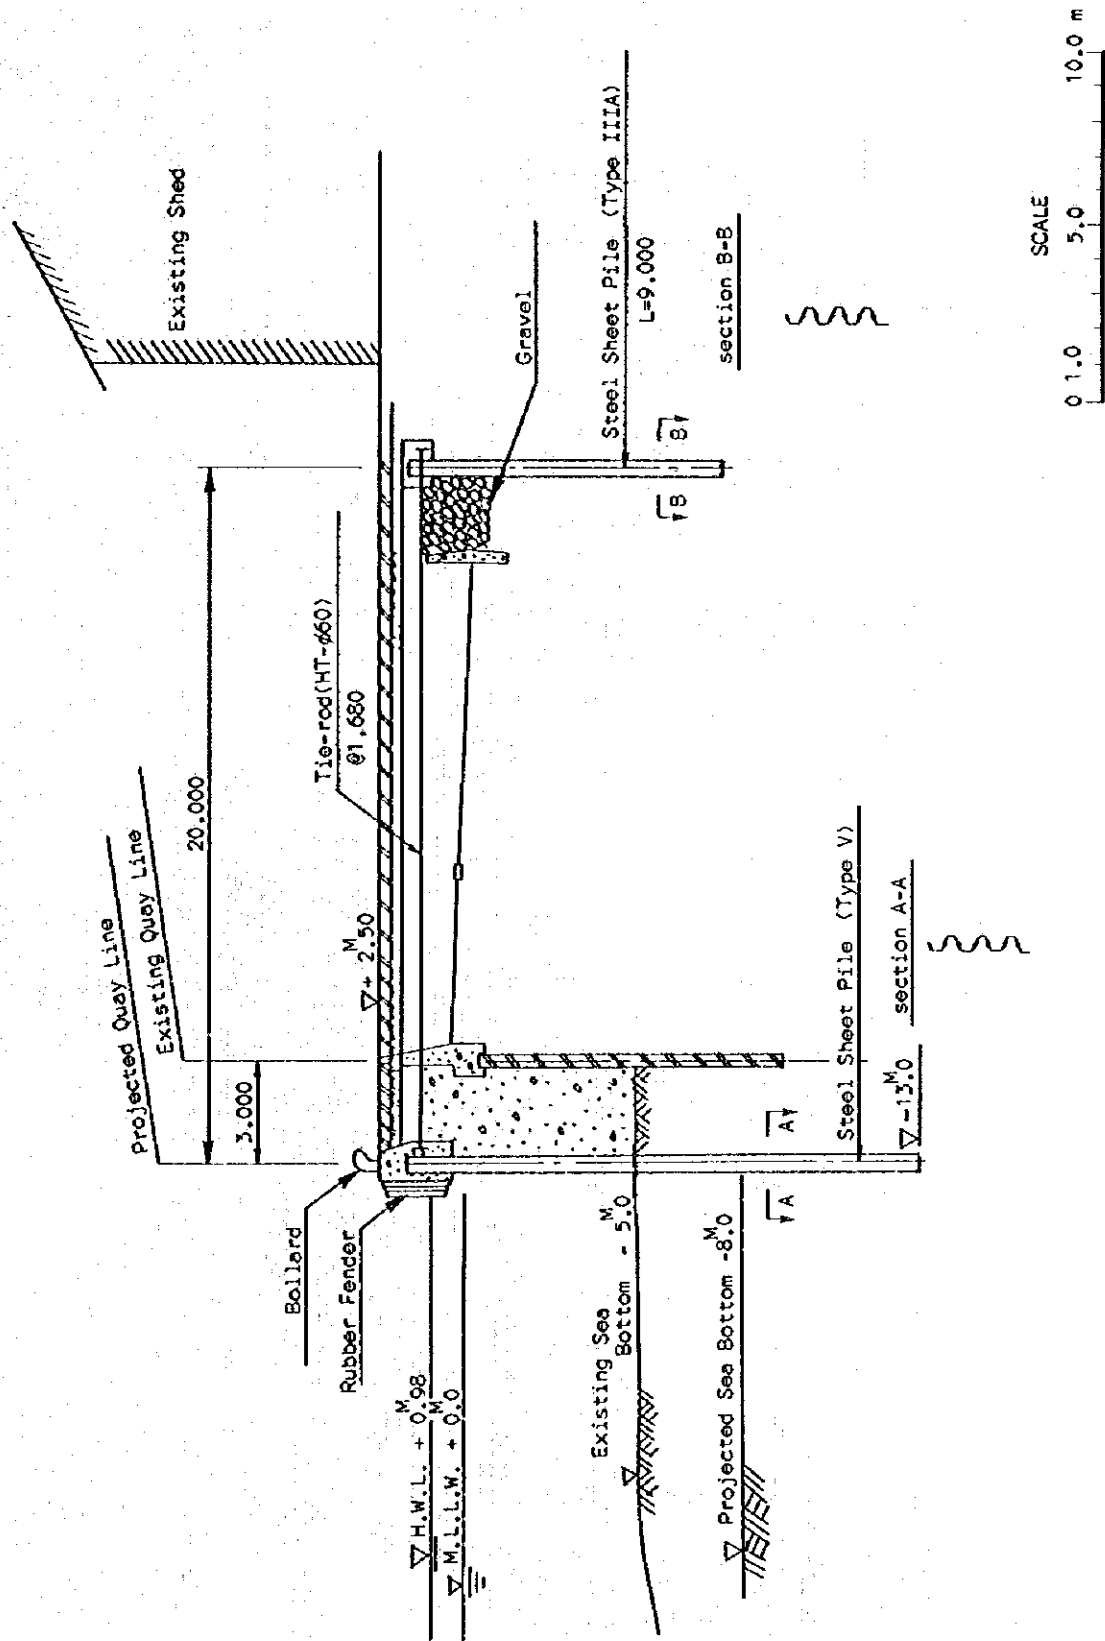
Proposed Section for Piers 8-14 (Projected Depth is MLLW -8.0M)
